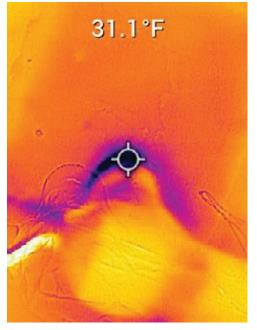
&9 – Interior ceiling plenum at exterior wall – roof leader insulated drain line. Penetration at the roof shows thermal leakage.
